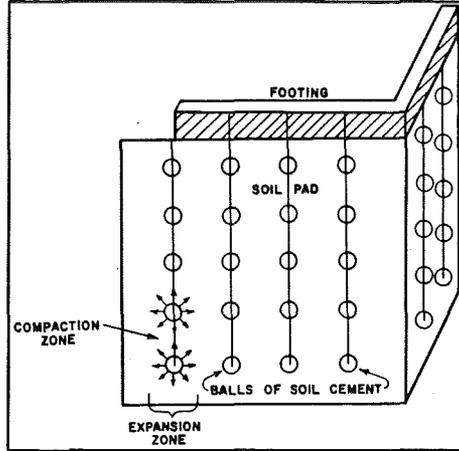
A demonstration of the soil-cement injection method of stabilizing damaged foundations.
